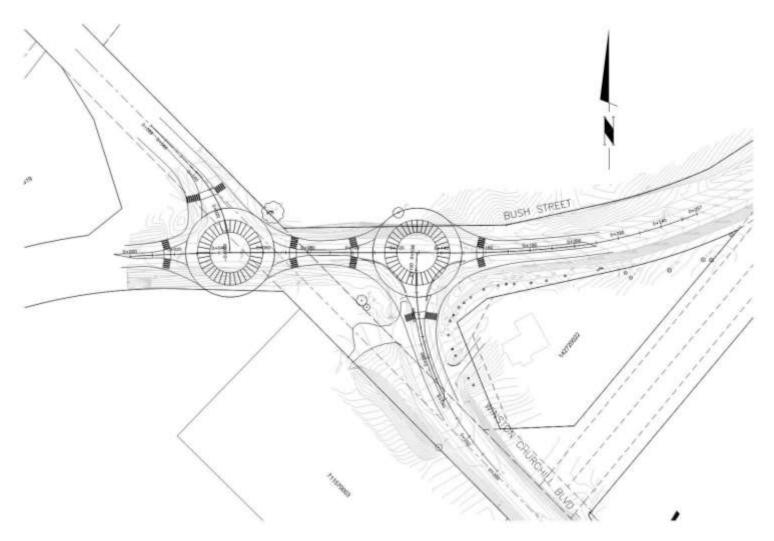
Bush Street / Winston Churchill Boulevard Roundabout Concept #2
